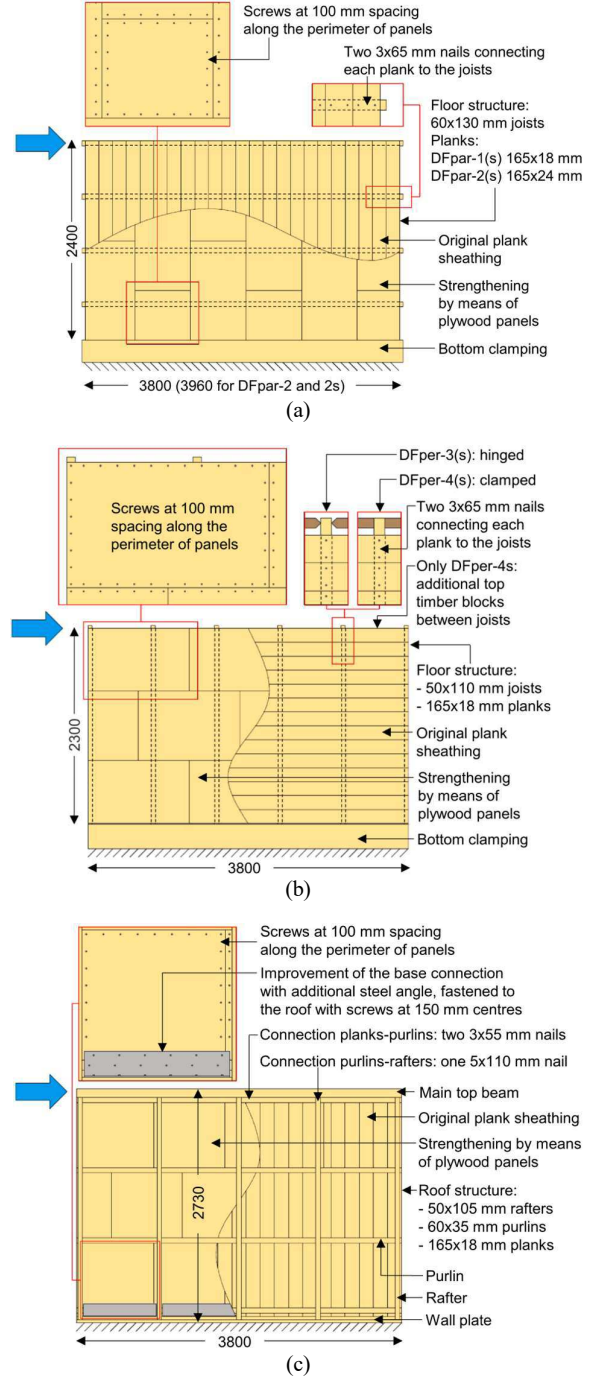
Tested timber diaphragms: (a) parallel to the joists, (b) perpendicular to the joists, (c) roof sample [4]; all reported dimensions are in mm
